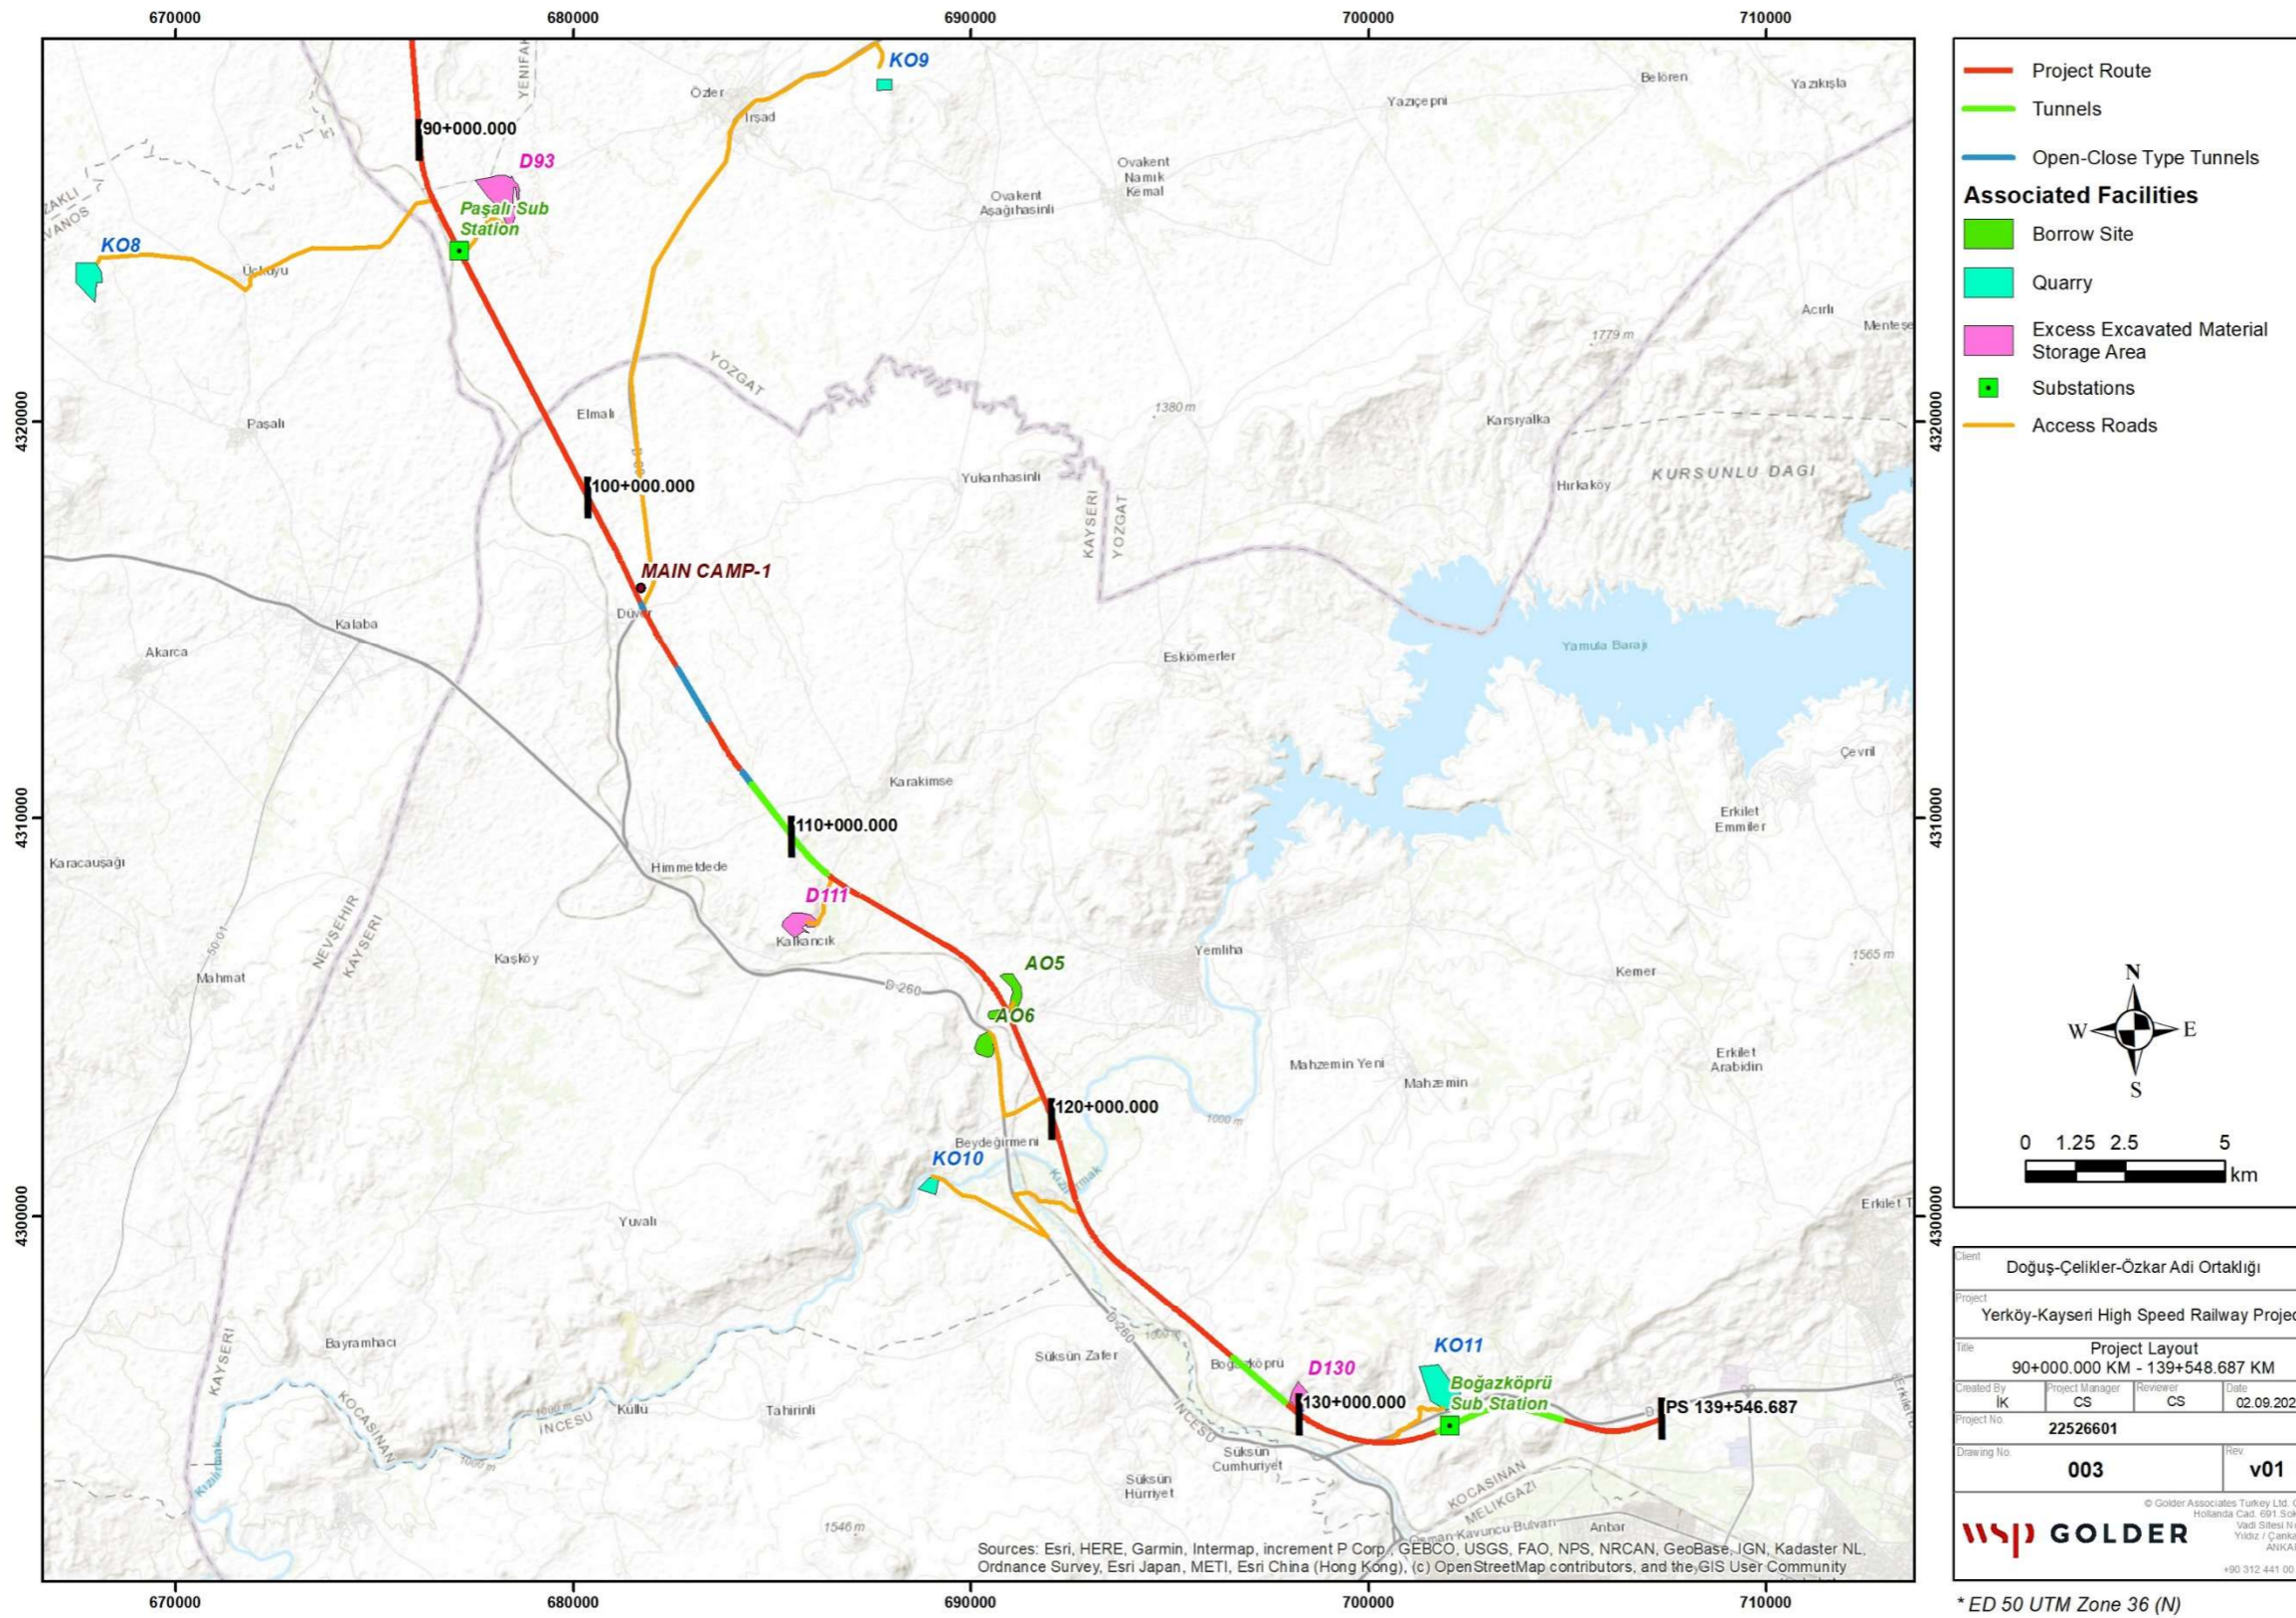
Project Layout 3 (Source: ESIA, 2022)
